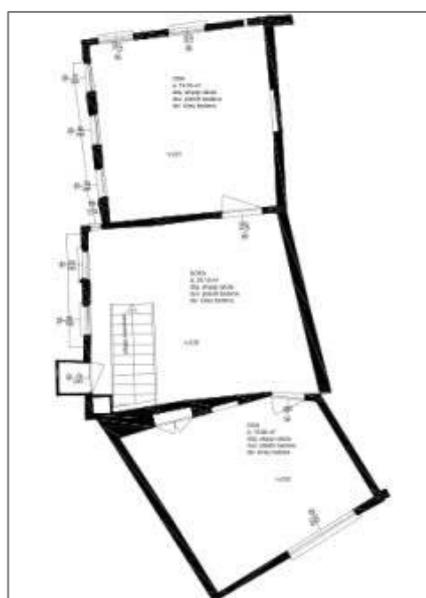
Plan type with enclosed sofa 2794-38 (Source: Piray Architecture)
